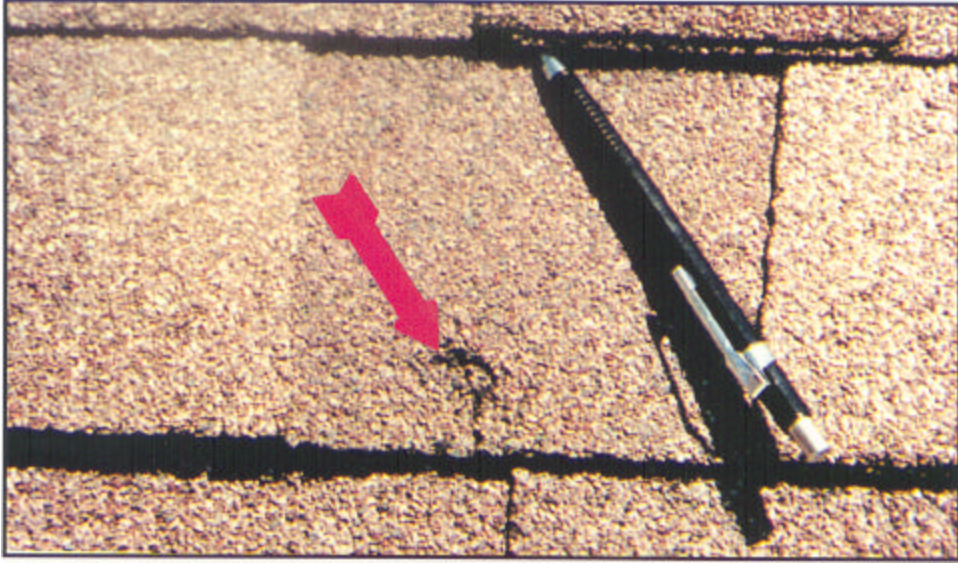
Close-up of another hailstone impact mark. Damage to light composition shingles generally does not occur until hard hailstones are greater than 1 inch in diameter. Heavier weight shingles generally are not damaged by hard hailstones less than 1-1/4 inches in diameter.
